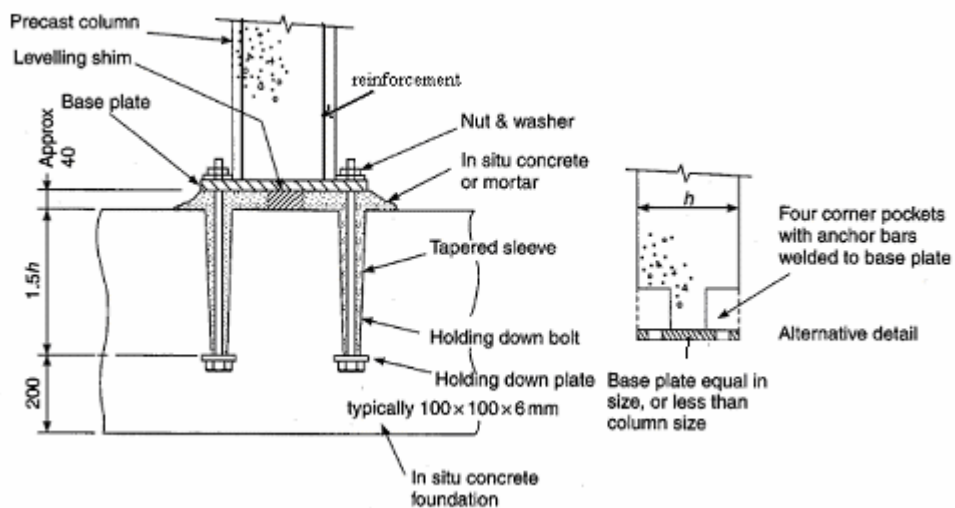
Column base plate connection, the column reinforcement is welded at the connection plate
